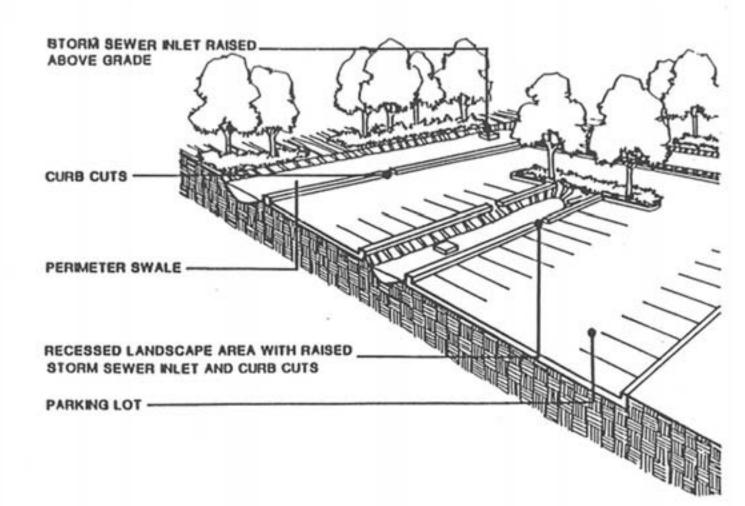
Parking Lot Swale Drainage (Northeast Illinois Planning Commission 1993).
